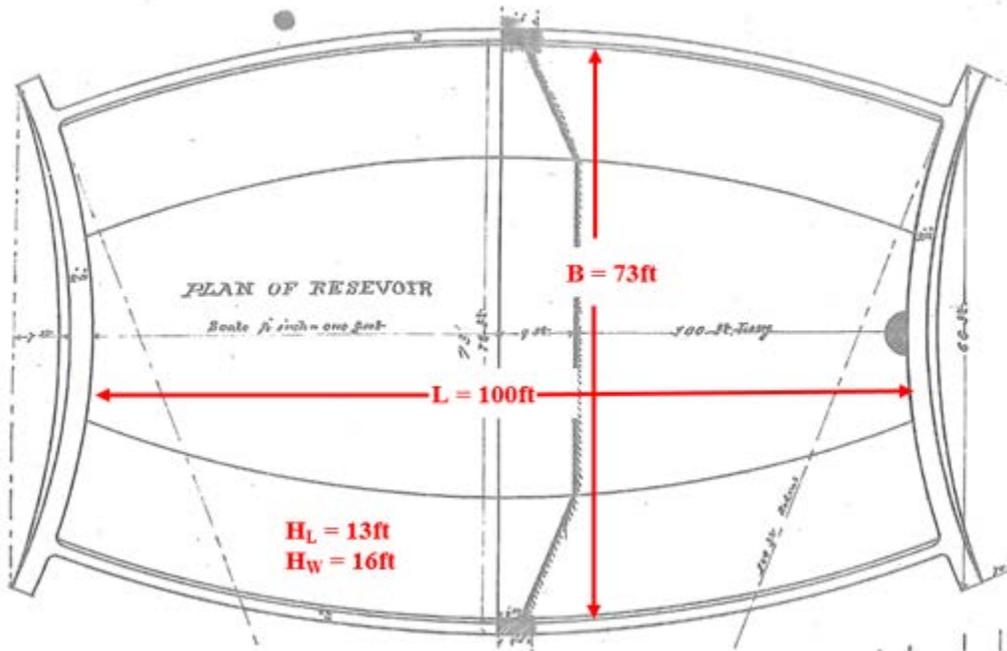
Sehome Reservoir Elevations Schematic and Dimensions based on Field Measurements (H_w = Wall Height, H_L = Operating Water Height relative to Wall, B = Width, L = Length)
